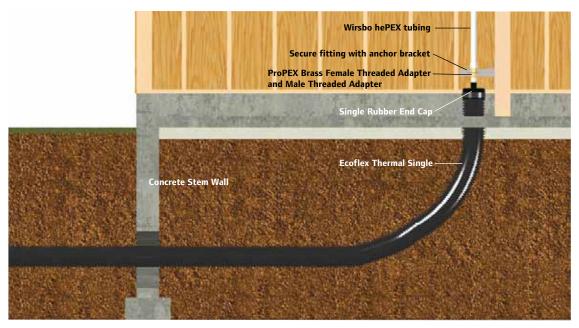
Slab-on-grade Through Sleeve Installation – Interior Wall Attachment
